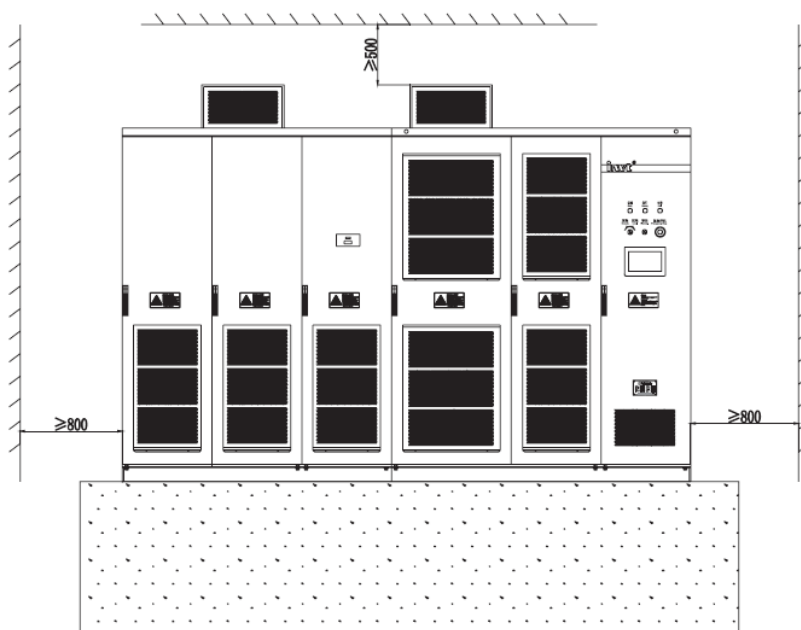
Schematic diagram 1 of installation requirements (front view, unit: mm)
